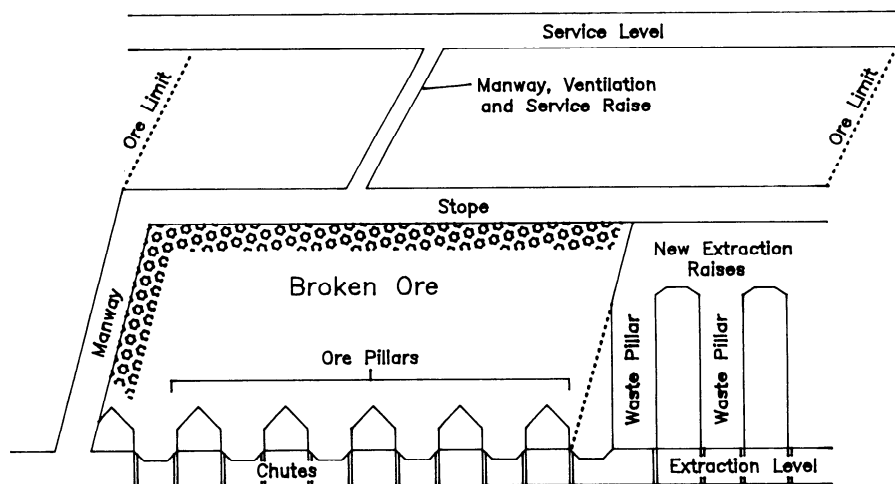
Longitudinal section—shrinkage on irregular ore body.
